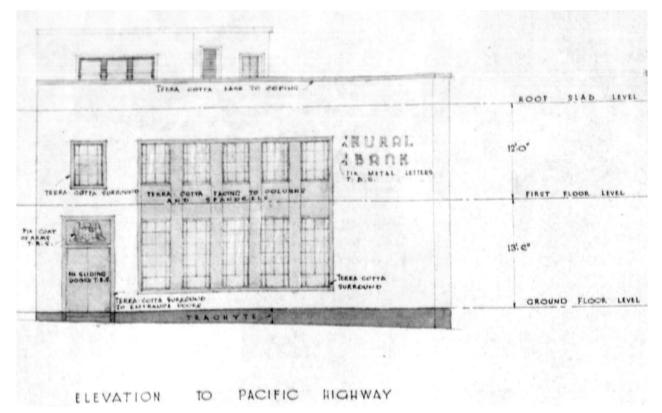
Extract from plans for Rural Bank Crows Nest Branch showing elevation to Pacific Highway. *Source: North Sydney Council Buildings Application Archive.
